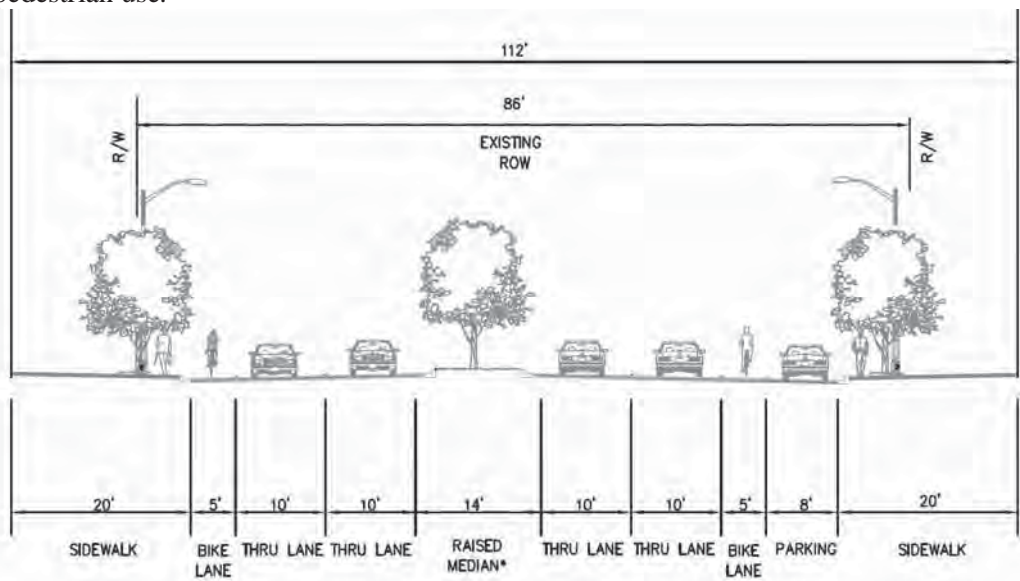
Proposed Cross Section, H Street Between Third Avenue and Broadway
